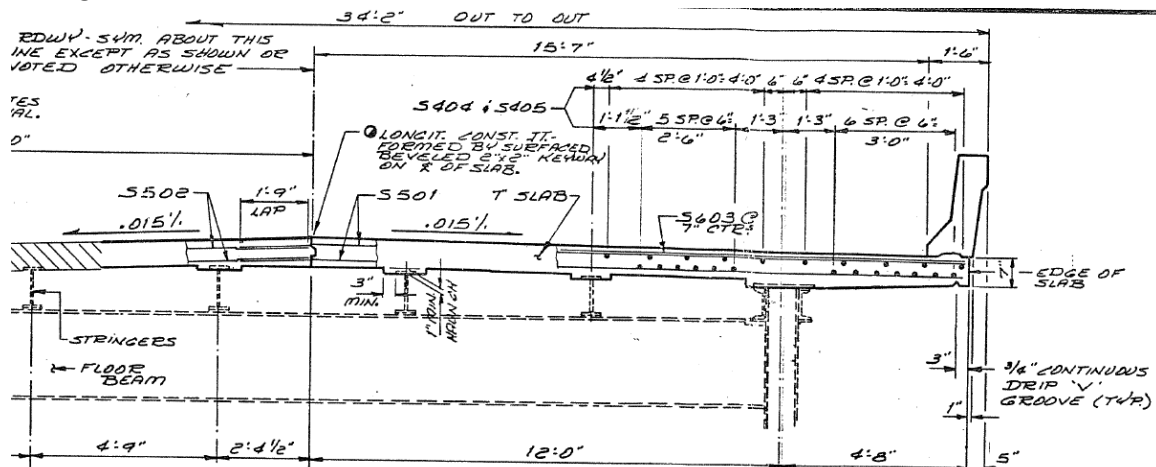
1980 deck cross section with 7" slab thickness.
